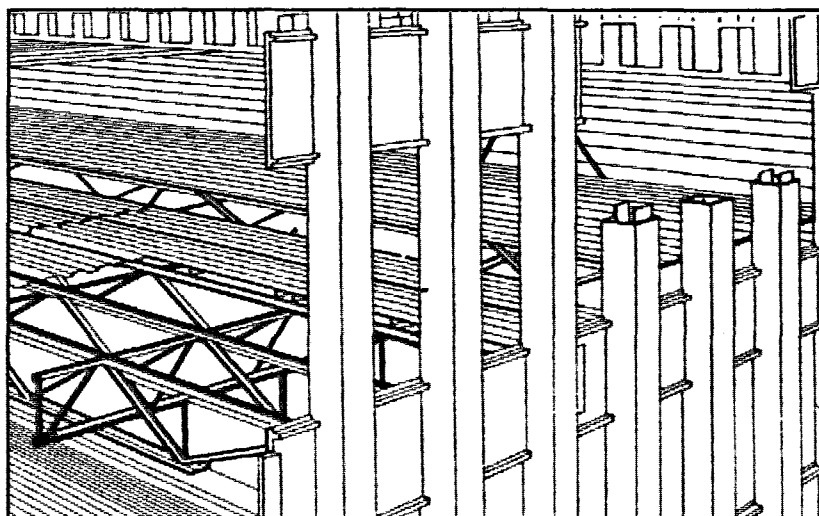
Isometric Views of Floor and Exterior Wall System
